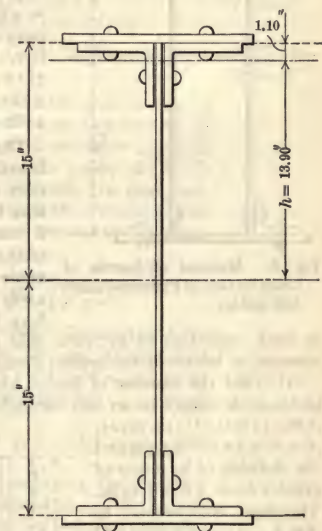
Moment of Inertia of Cross-section of Plate Girder with Flange-plates
